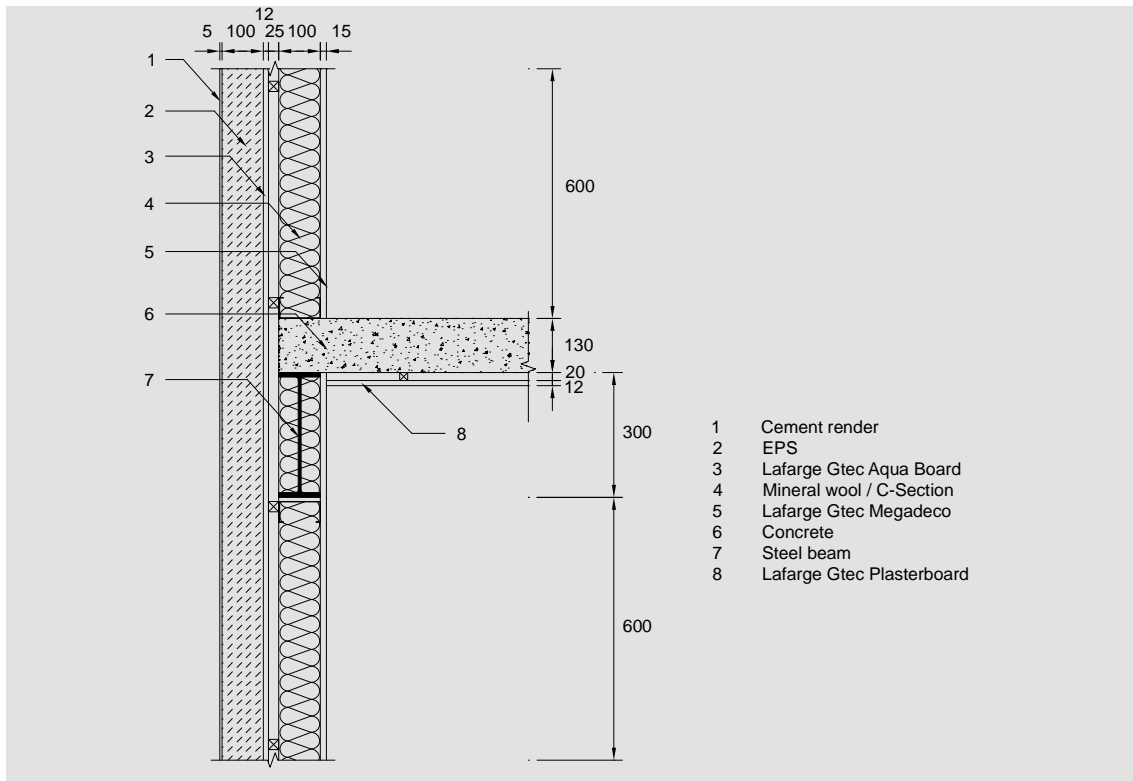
Light steel infill wall in a steel framed building – cavity system with single layer of board is shown
